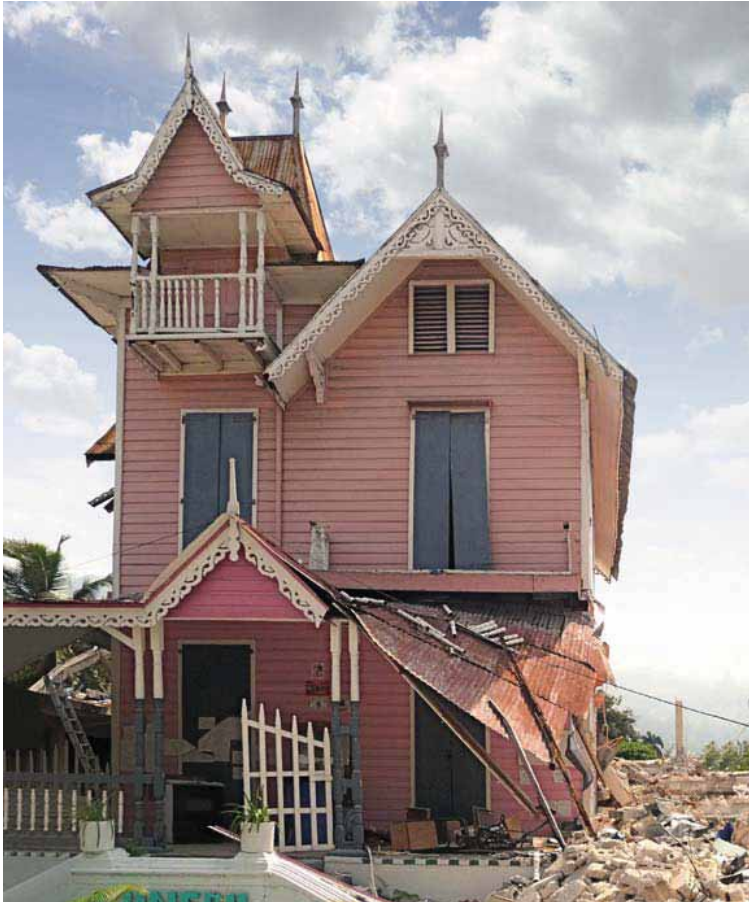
Wood frame Gingerbread at the Episcopal University at 14 Rue Légitime next to the site of a collapsed concrete building.
